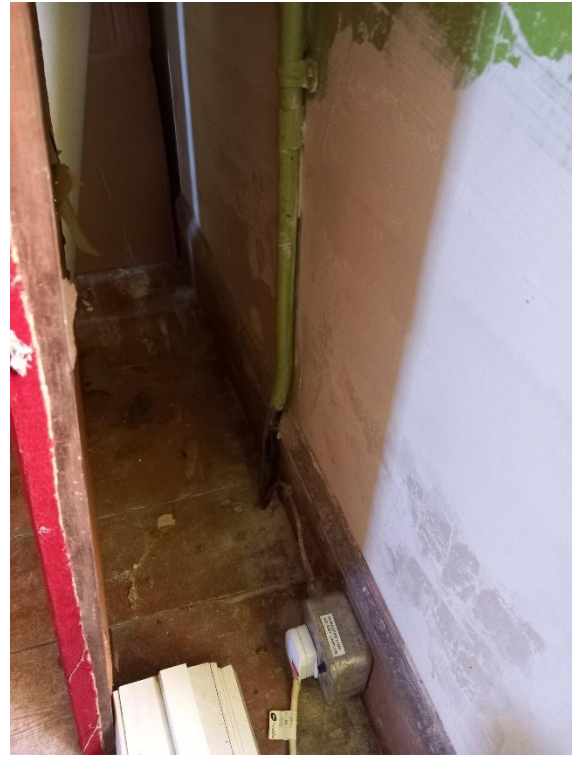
Location of cable into the Tower Store, where new equipment cabinet will be sited.
